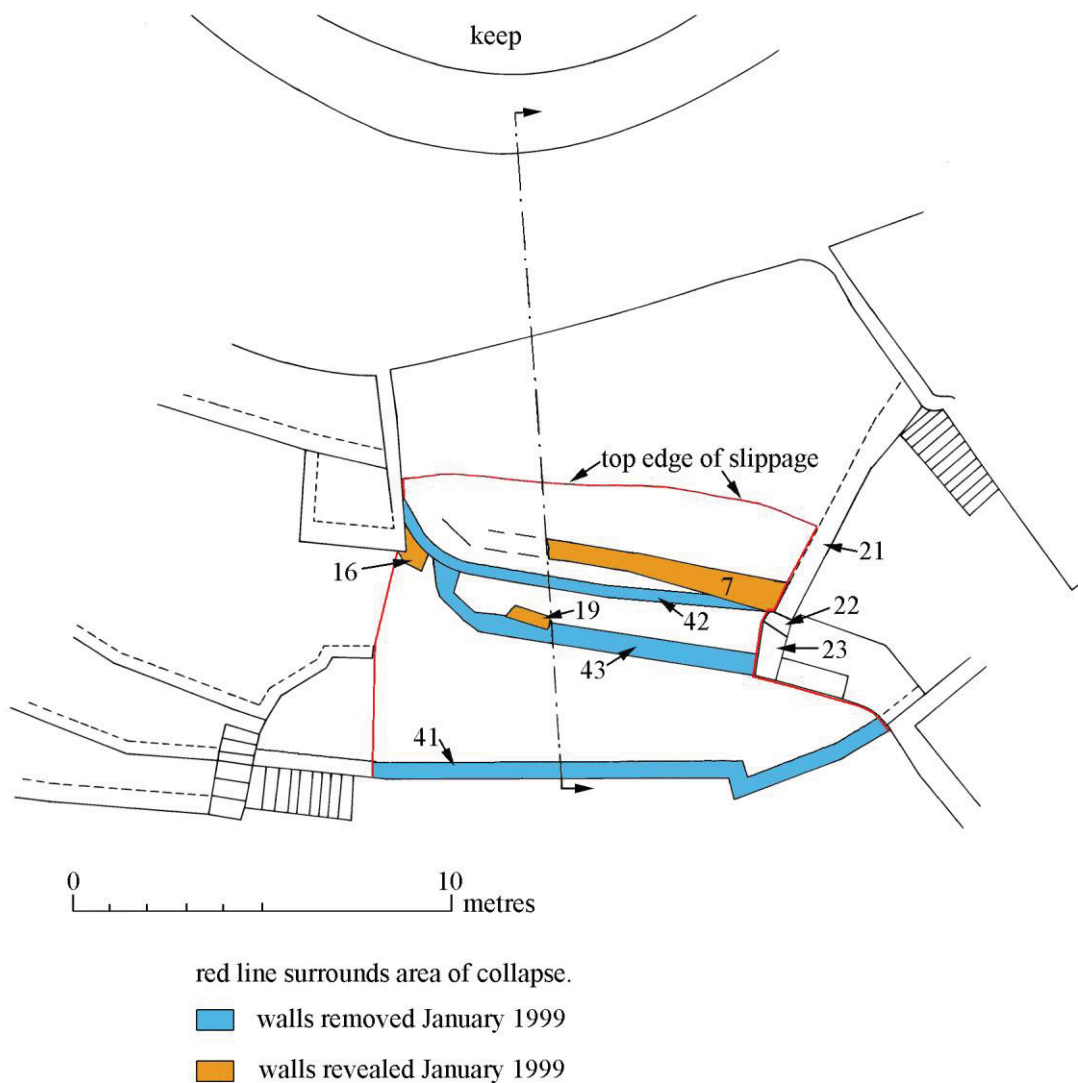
plans showing 1. location and 2. walls in area of collapse.
